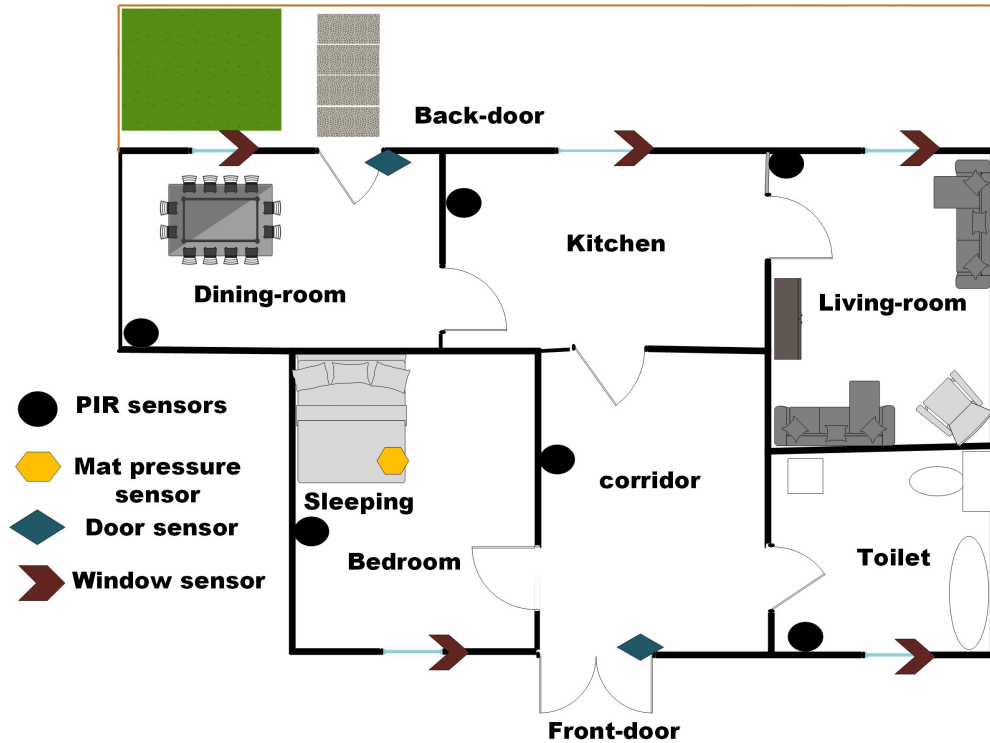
Floor plan layout and location of the installed sensors used for data collection in dataset E.
